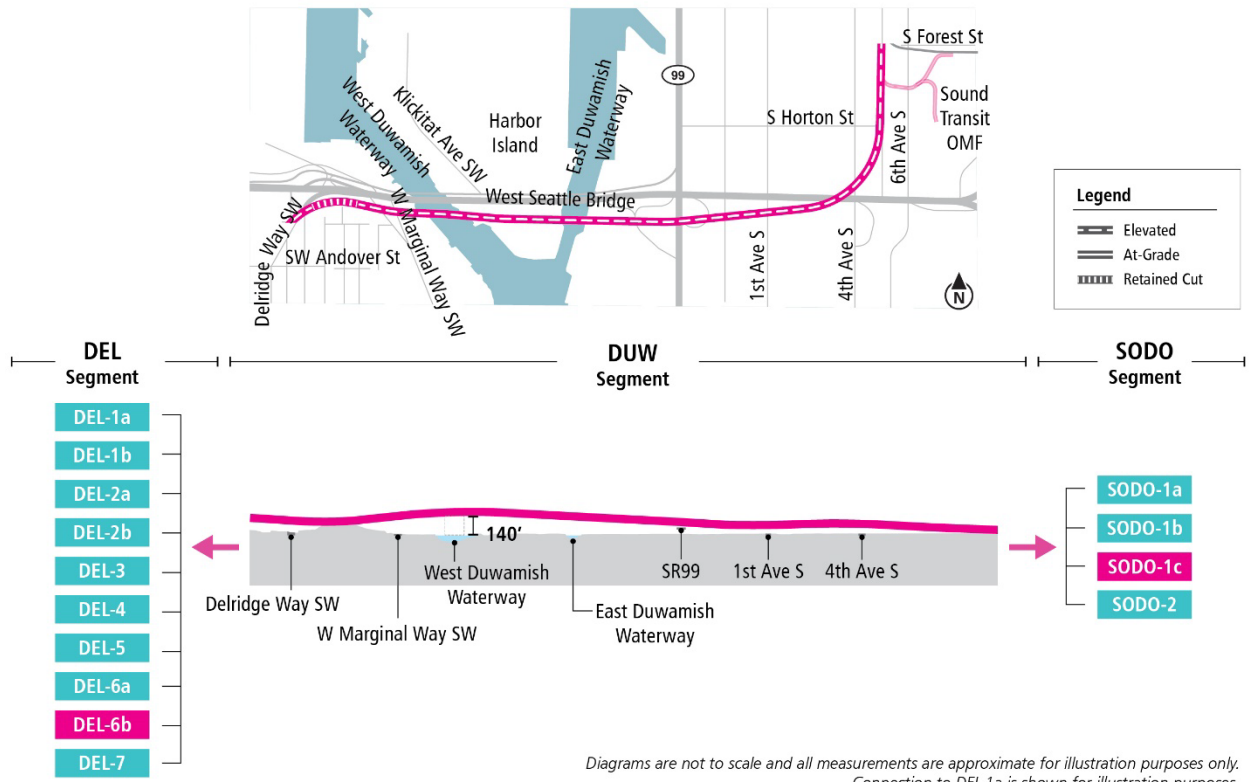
Plan and Profile for Preferred South Crossing Alternative (DUW-1a)
